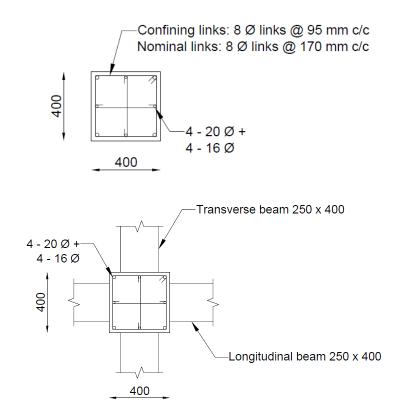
Detailing for Columns from ground floor to 2nd floor
